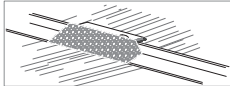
B. Perspective view of a gravel curb inlet protection.
